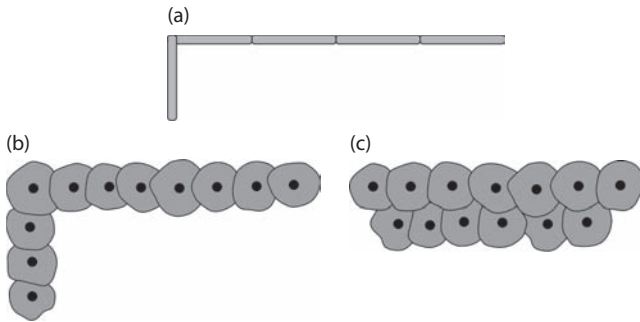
Elements used to form cutoff walls. (a) Intersecting panels or structural elements. (b) Overlapping columns or piles. (c) Multiple rows of overlapping columns.
